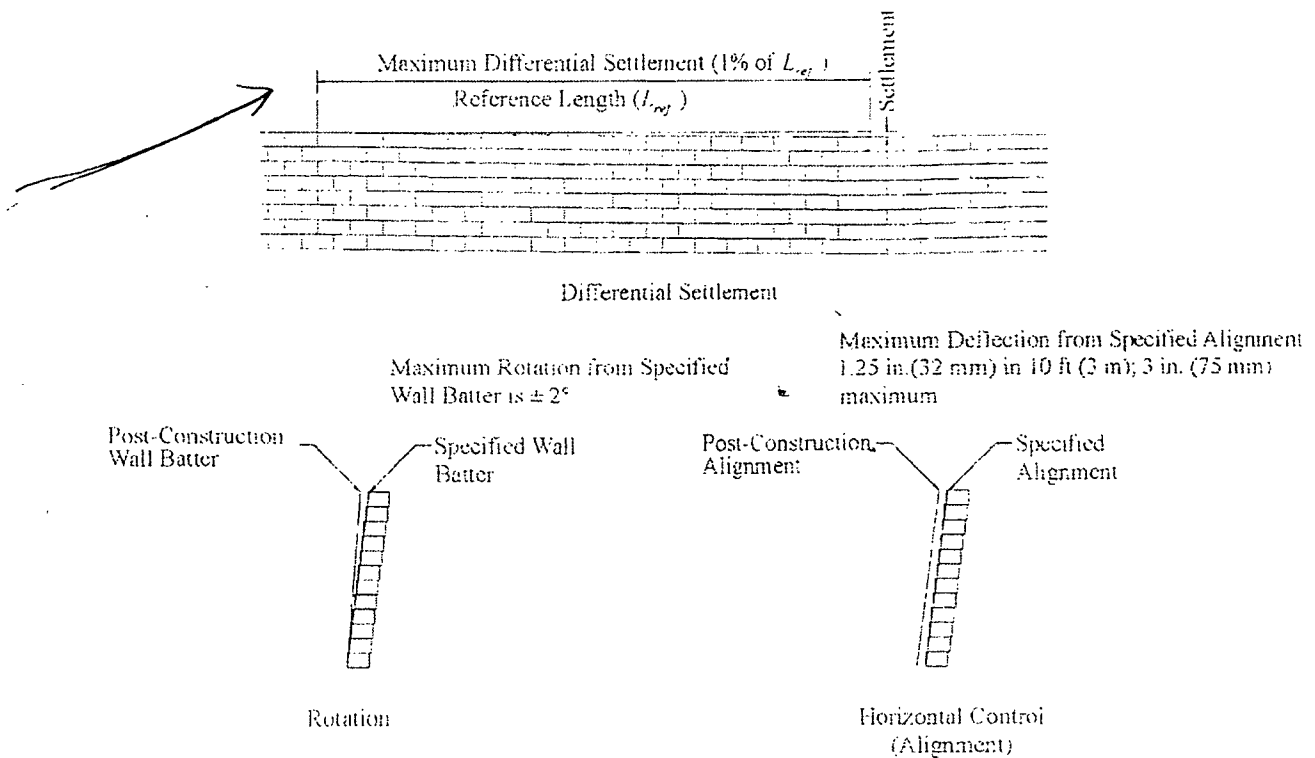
Recommended Maximum SRW Construction Tolerances
